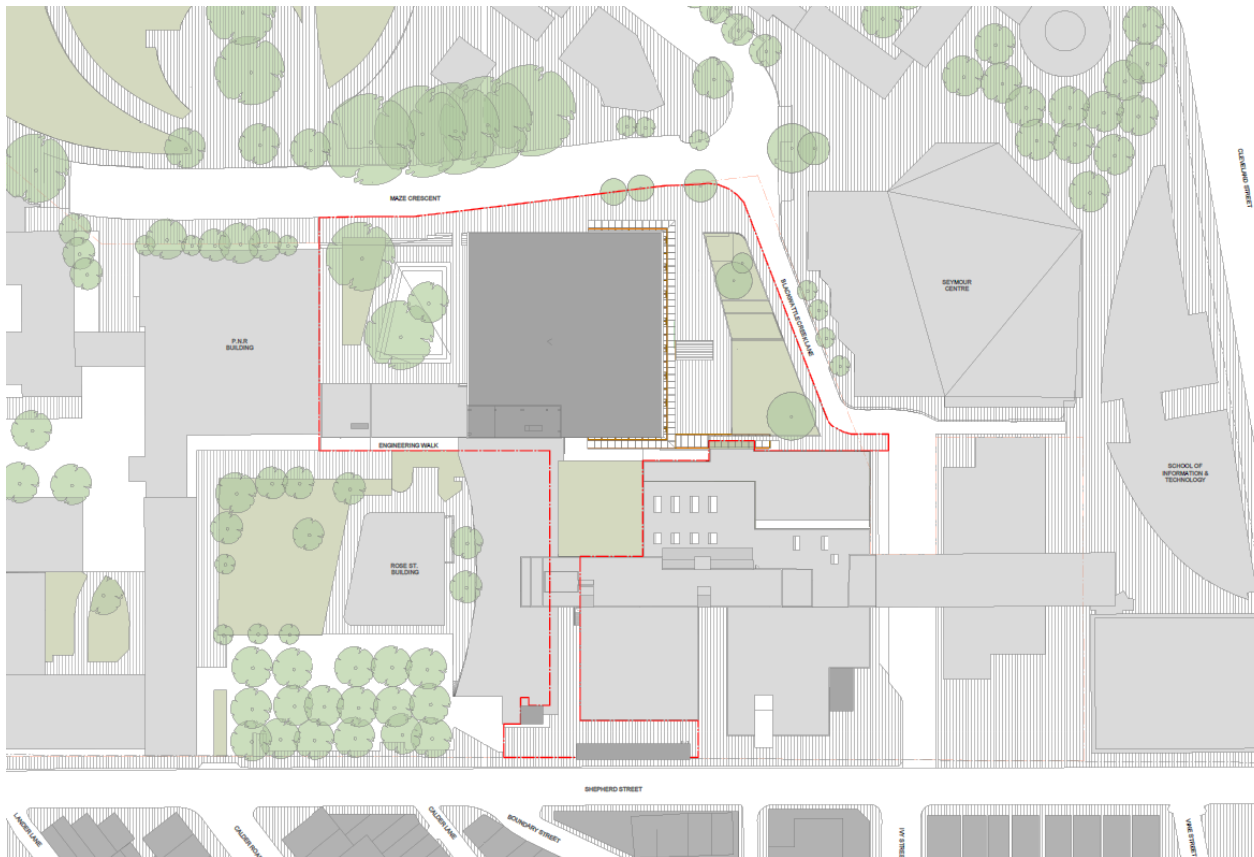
Site Plan showing the subject site for the Electrical Engineering building (J03) outlined in red (not oriented in a northerly direction)
